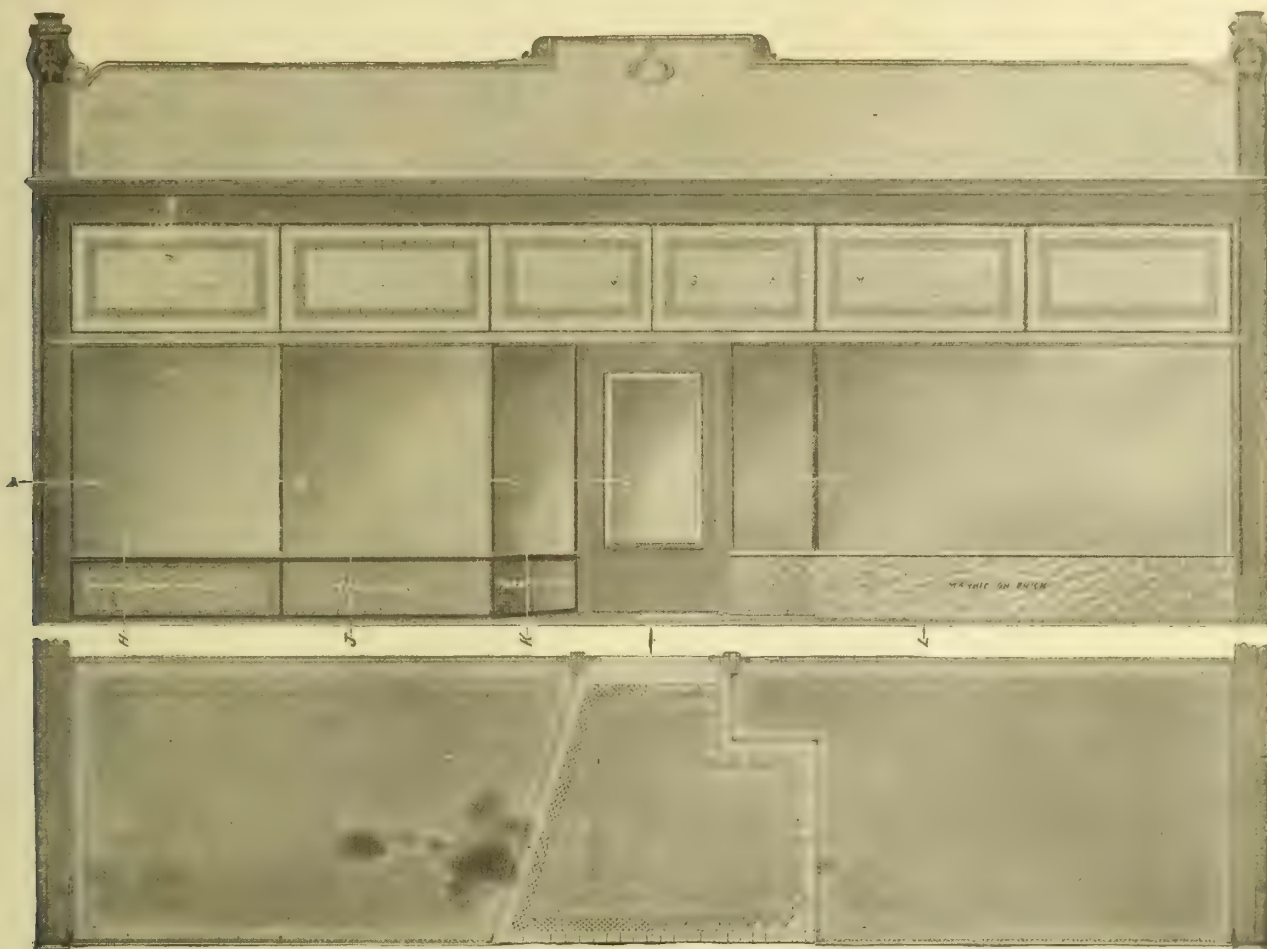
ELEVATION AND PLAN OF FROST-PROOF STORE FRONT
